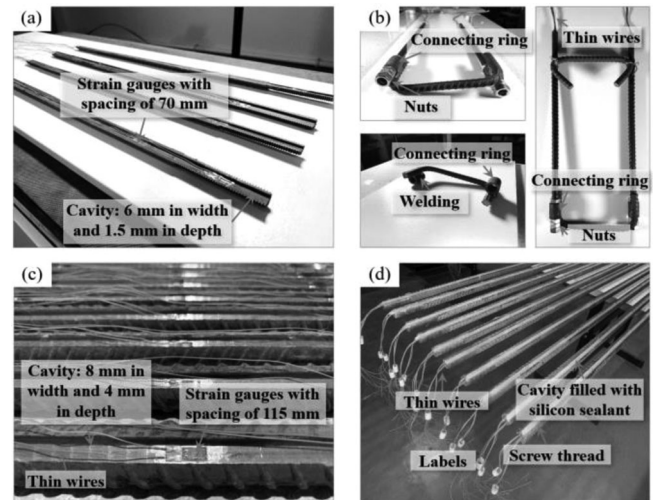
Fabrication of strain gauges: (a) cutting stirrup leg into two halves and making inside cavity; (b) assembling stirrups by high strength epoxy resin and nuts; (c) making cavity on longitudinal reinforcement surface; and (d) filling the cavity by silicon sealant (Gu et al., 2022)
